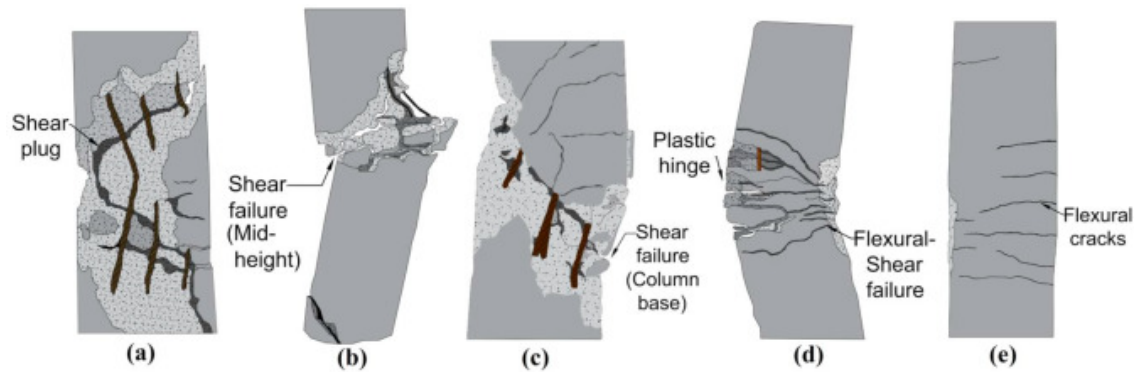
Typical failure modes of reinforced concrete bridge piers due to vessel impact (Gholipour et al., 2021).
